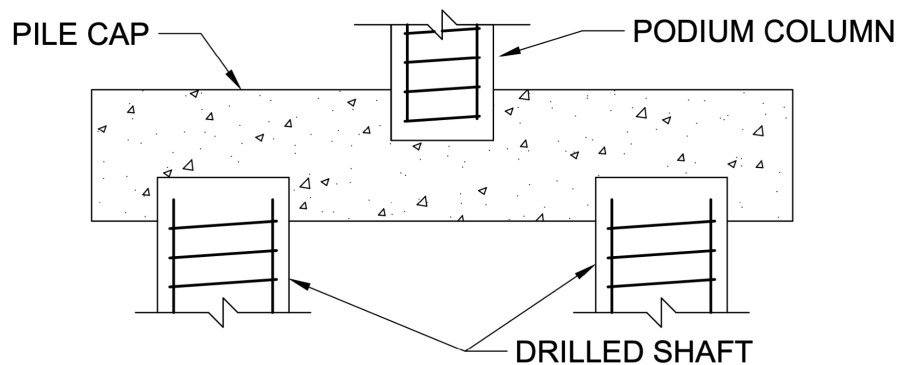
Schematic of drilled shafts connected to the podium column using a pile cap.
